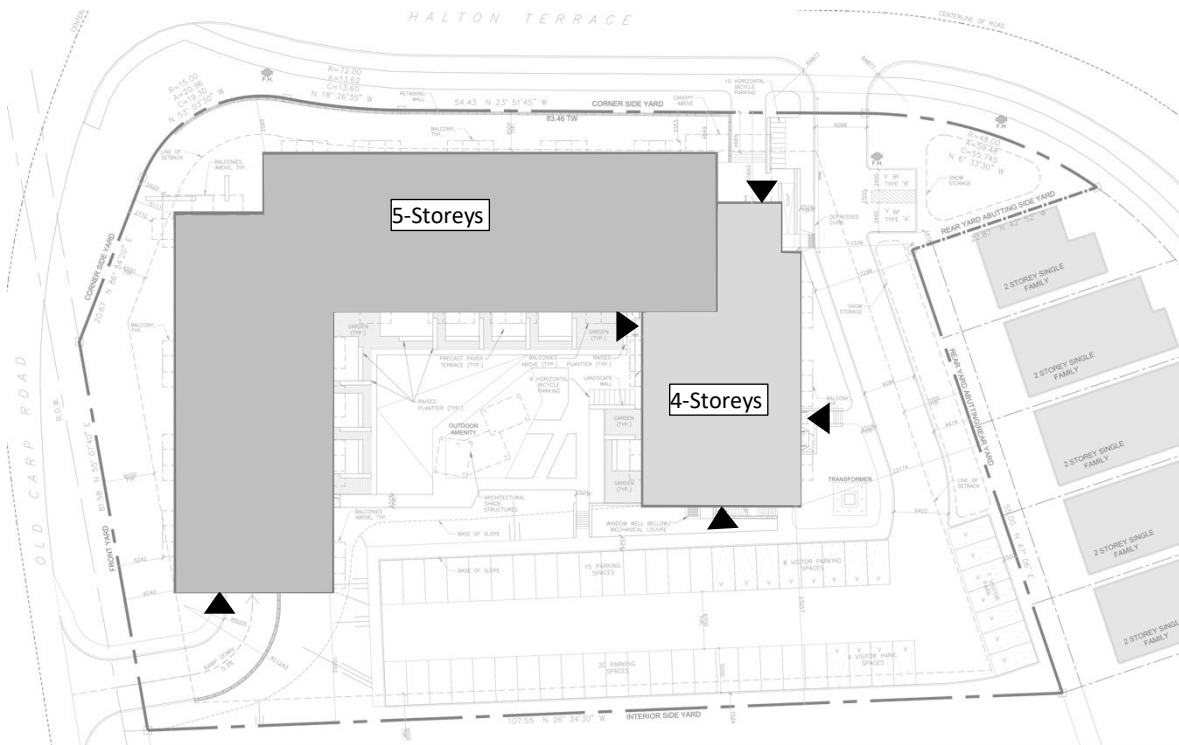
Extract of Site Plan (Source: Colizza Bruni, markup by Q9 showing accesses)
